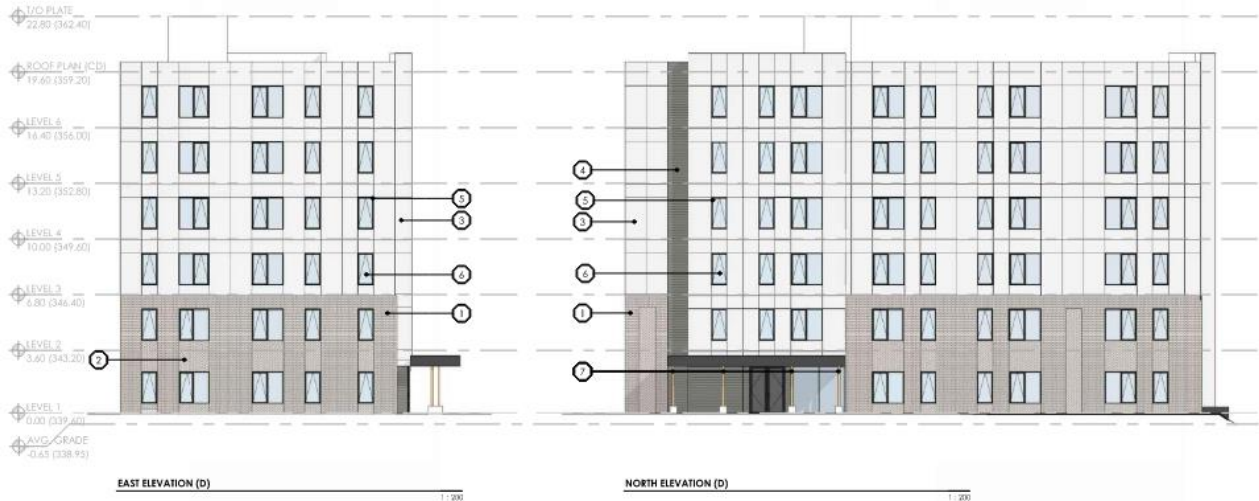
Proposed East Elevation (rear façade) and North elevation (facing Church Street).
